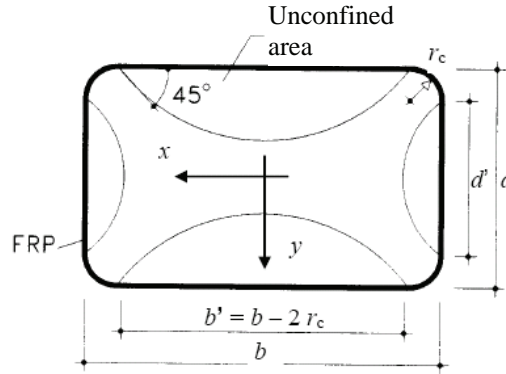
Confinement of rectangular sections externally wrapped with FRP.
